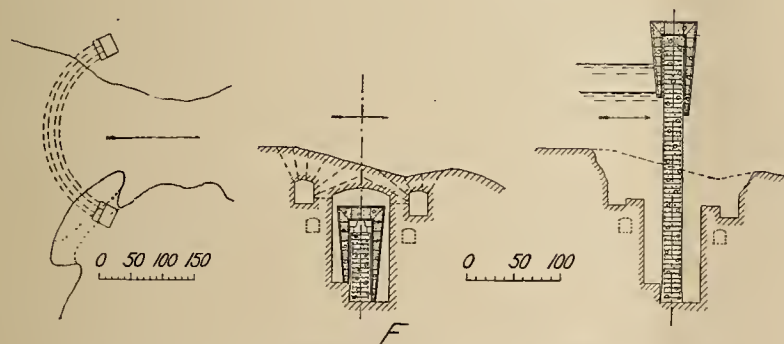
Another Suggested Scheme for a Concrete Dam.
